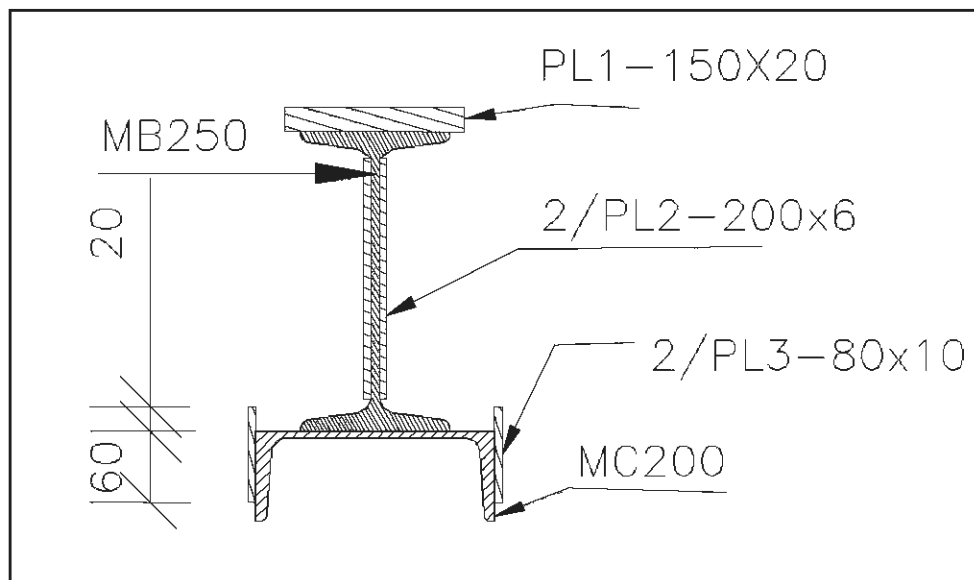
Section of B1 (Add plates PL1, PL2 & PL3 to B2)
